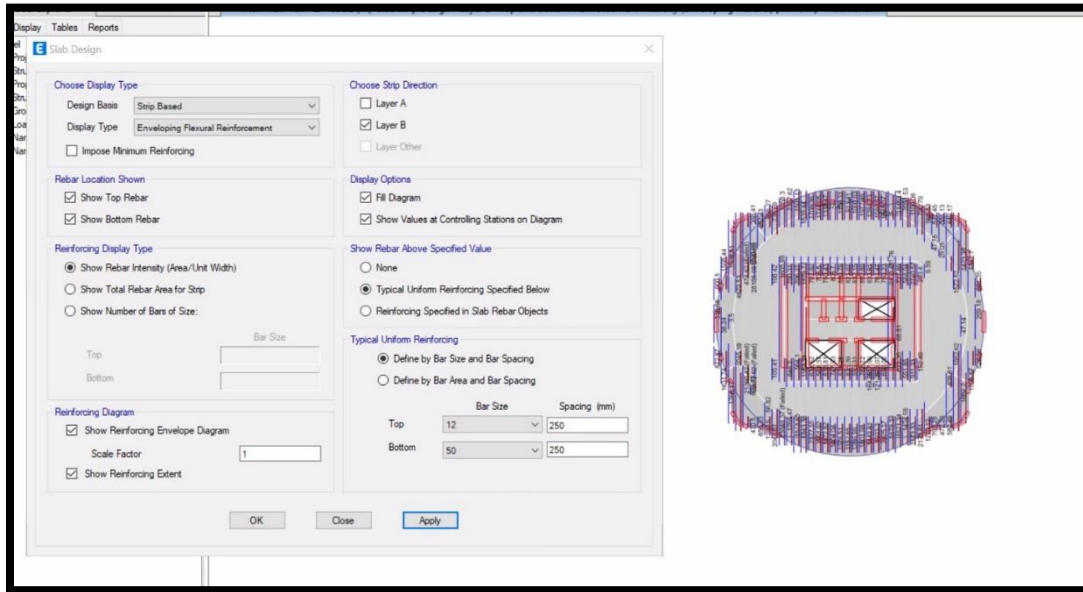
Top Reinforcement in Y-Direction for Non-Drop Panel Regions in 97th Floor
